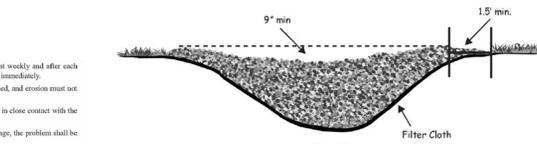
Stone check dam stone should be placed over the channel banks to keep water from cutting around the dam.
